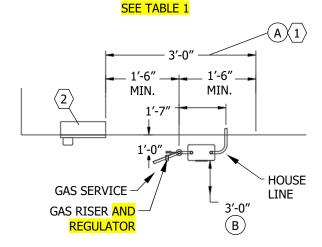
WORKING CLEARANCE REQUIREMENTS FROM SDG&E-OWNED ELECTRIC METER AND GAS METER SET ASSEMBLY C I PLAN VIEW SEE TABLE 1
